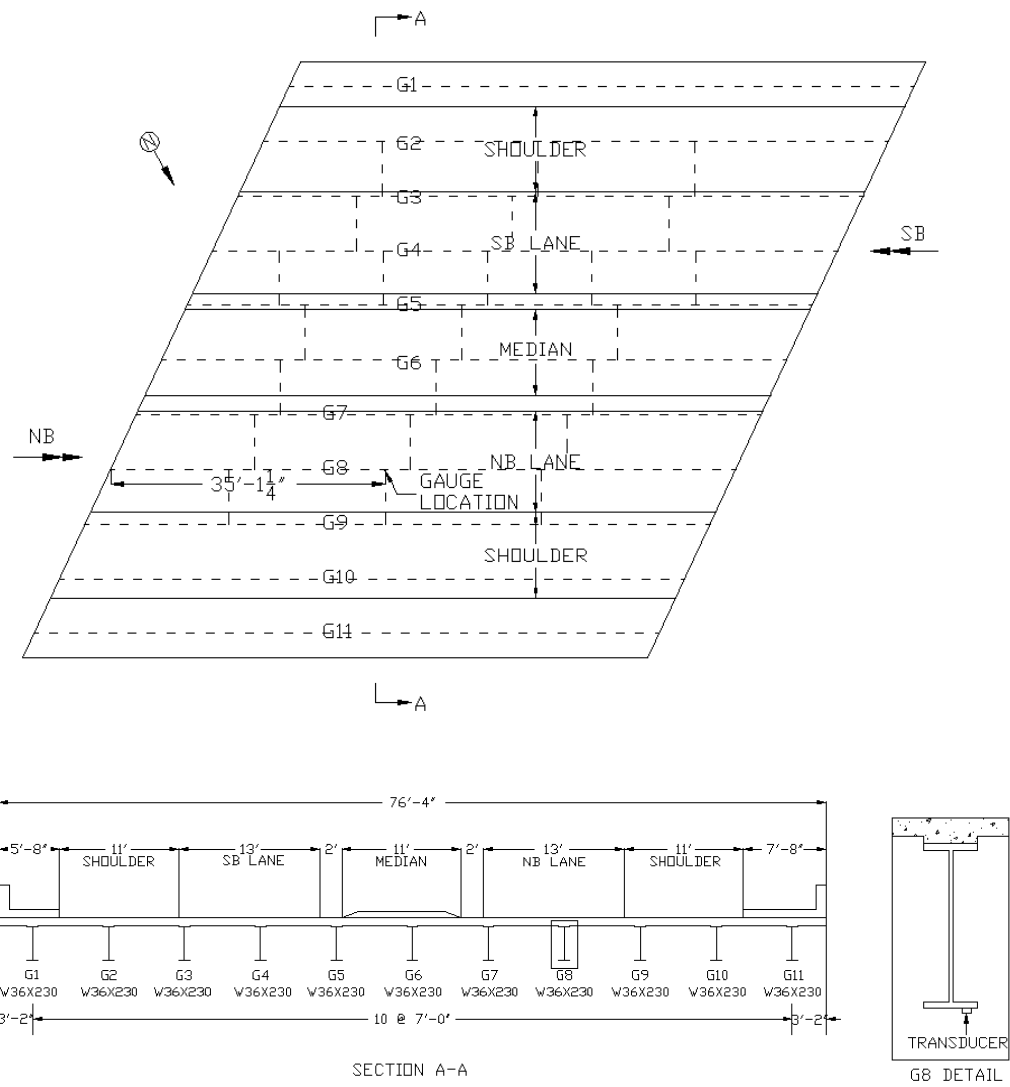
Bridge 1-394 S plan, cross-section and Girder 2 detail
